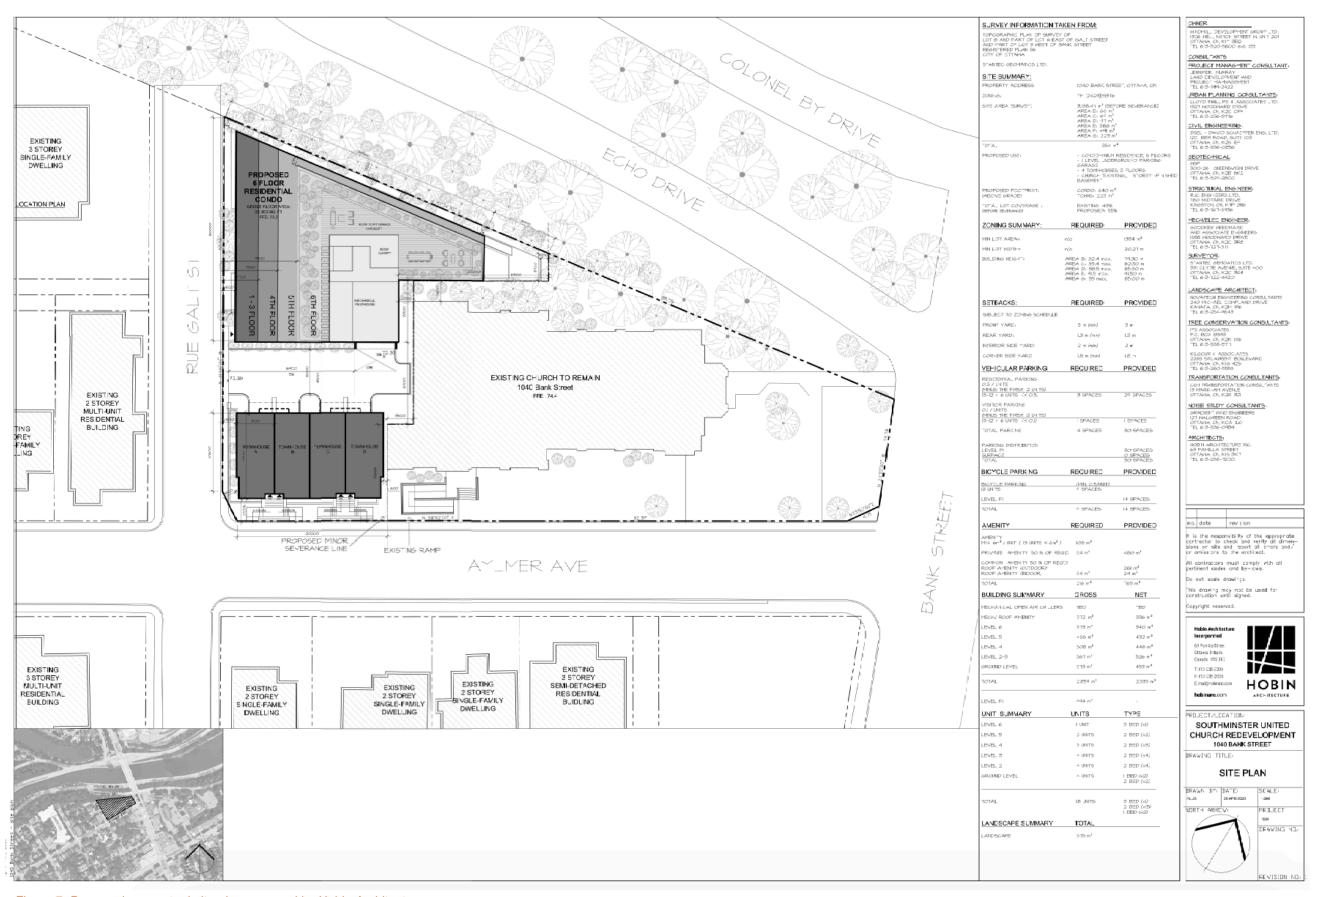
Proposed conceptual site plan prepared by Hobin Architecture
